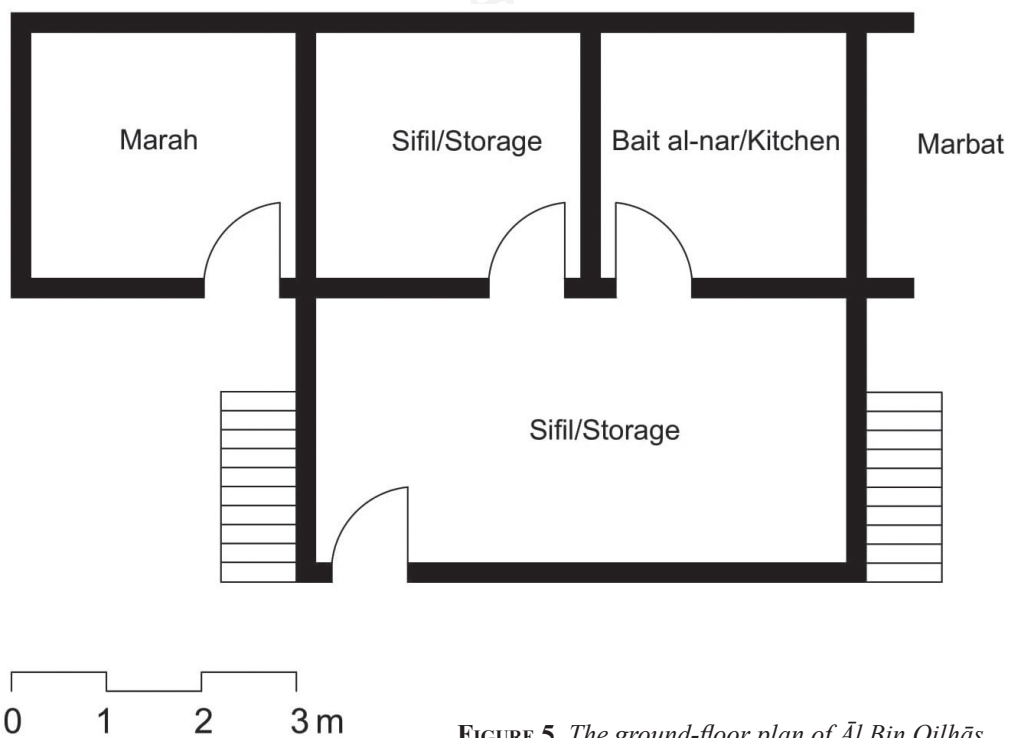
The ground-floor plan of Āl Bin Qilhās house (drawn by Aisha Alshehri).
